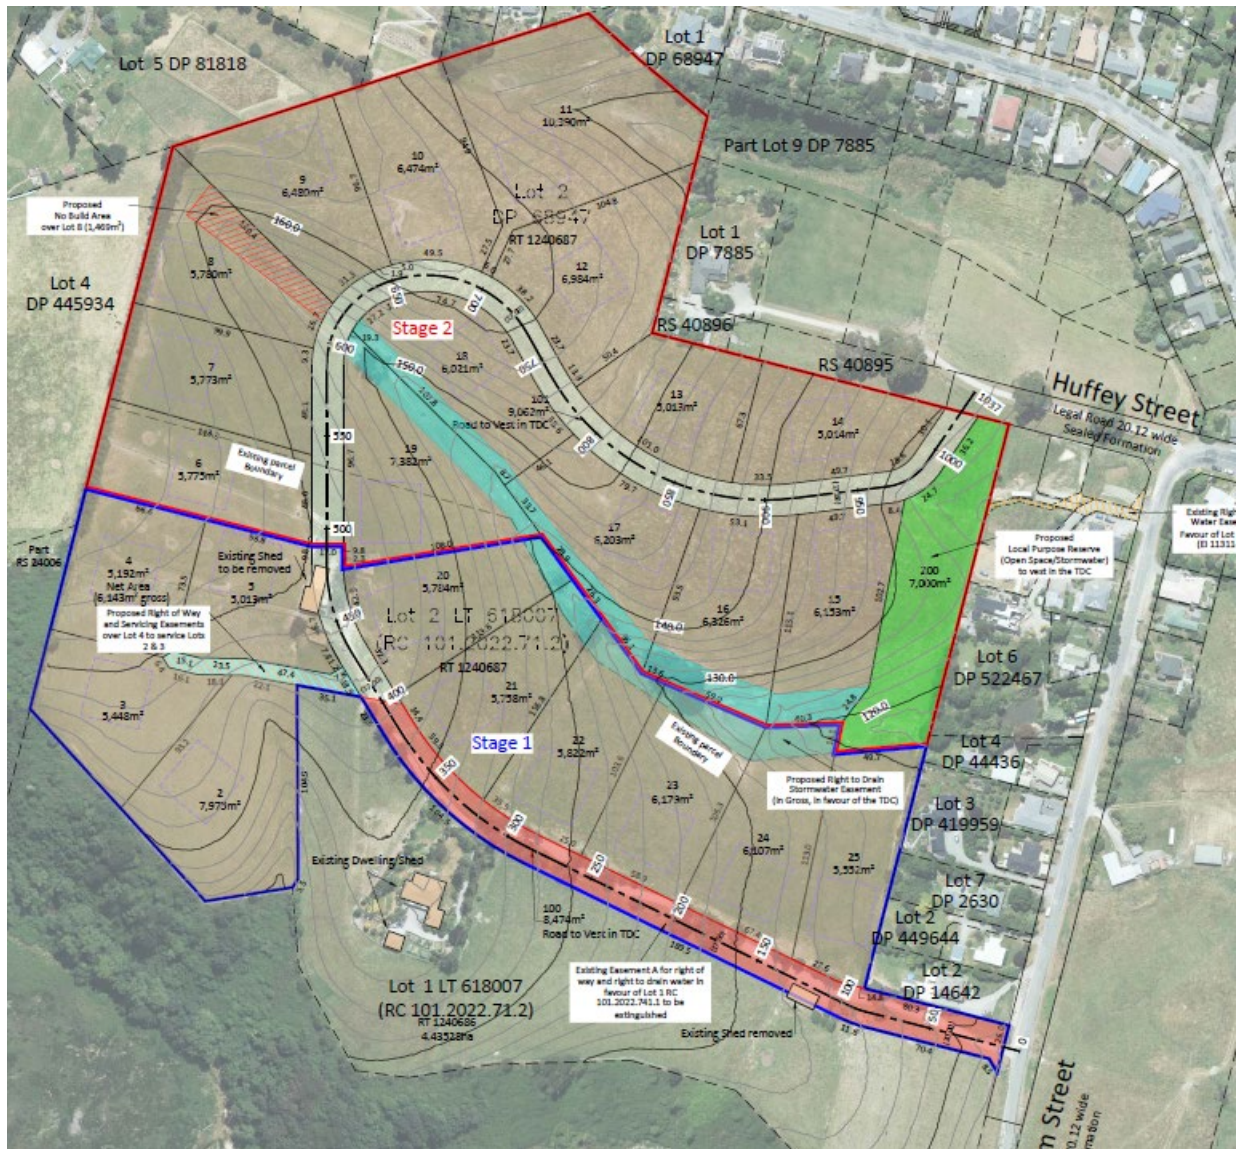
Proposed subdivision layout. Source Davis Ogilvie
